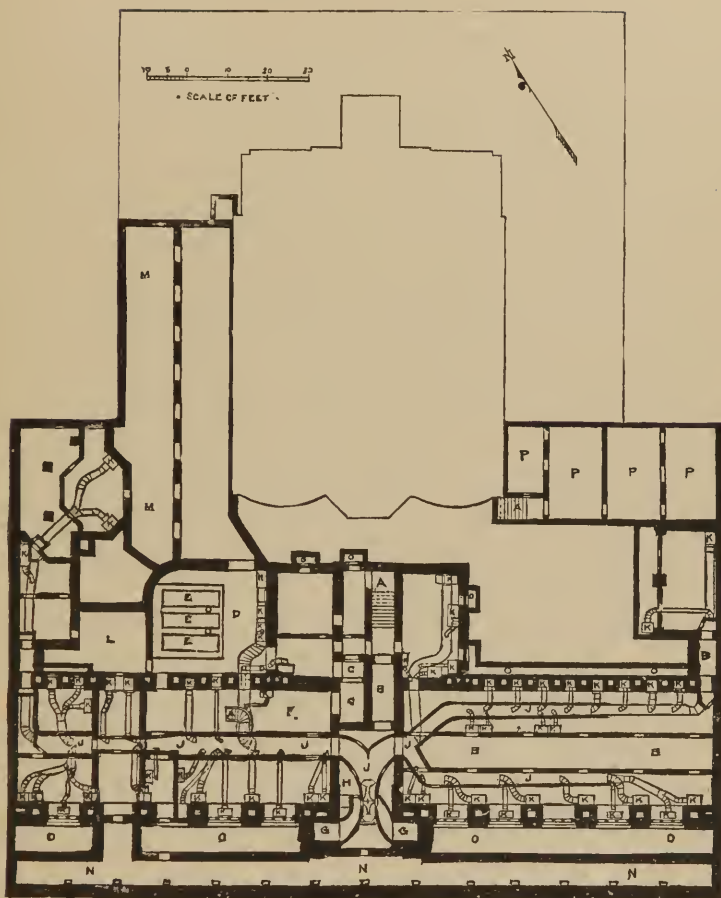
NEW YORK HOSPITAL BUILDINGS.—PLAN OF CELLAR.
